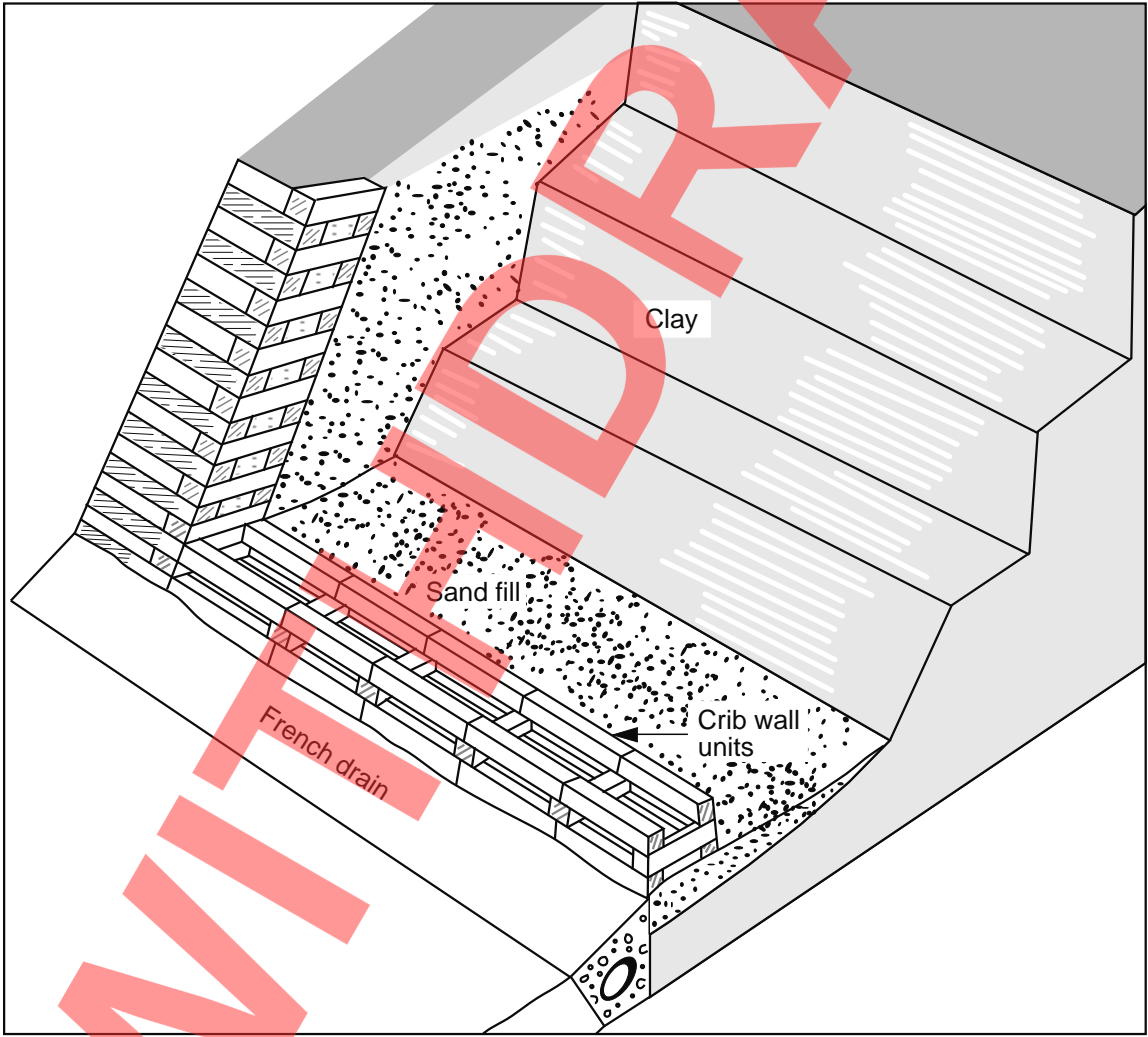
/5. SECTIONED VIEW OF CRIB WALL
